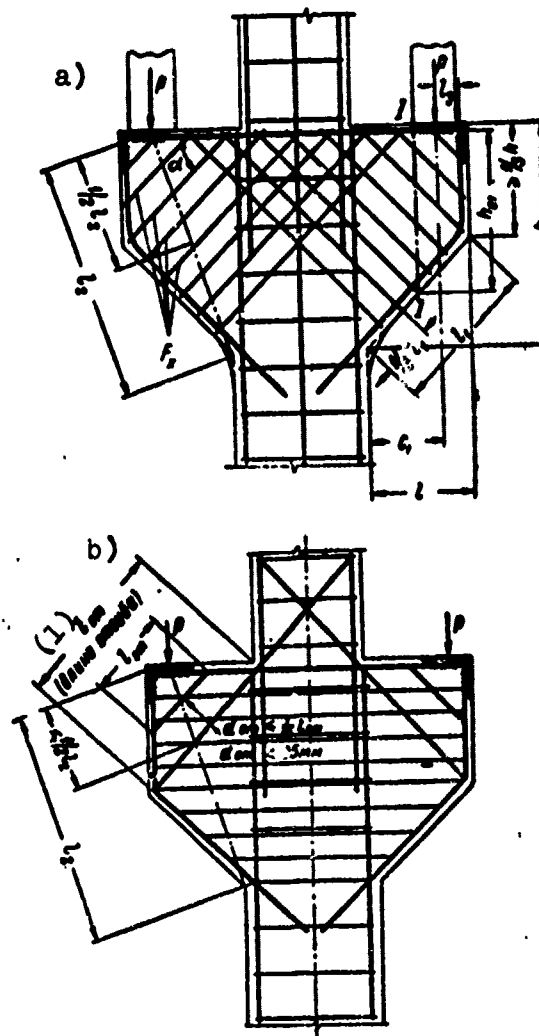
Reinforcement in short cantilevers a) with inclined stirrups; b) with bent-up rods and horizontal stirrups.
